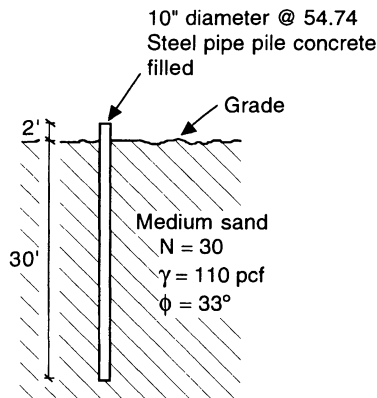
Example 8-4—Steel pipe pile in sand.
